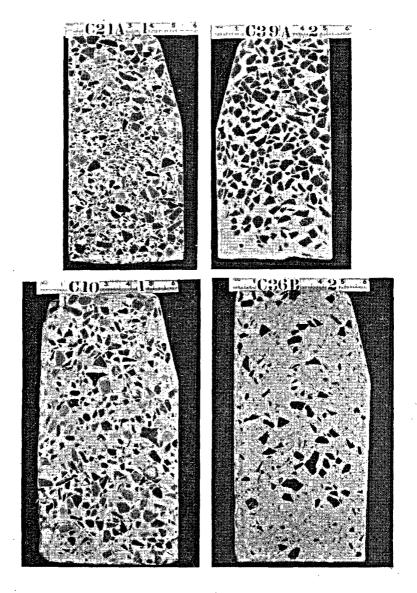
Typical sawn cross-section of precast concrete kerbs showing diversity of structure.
